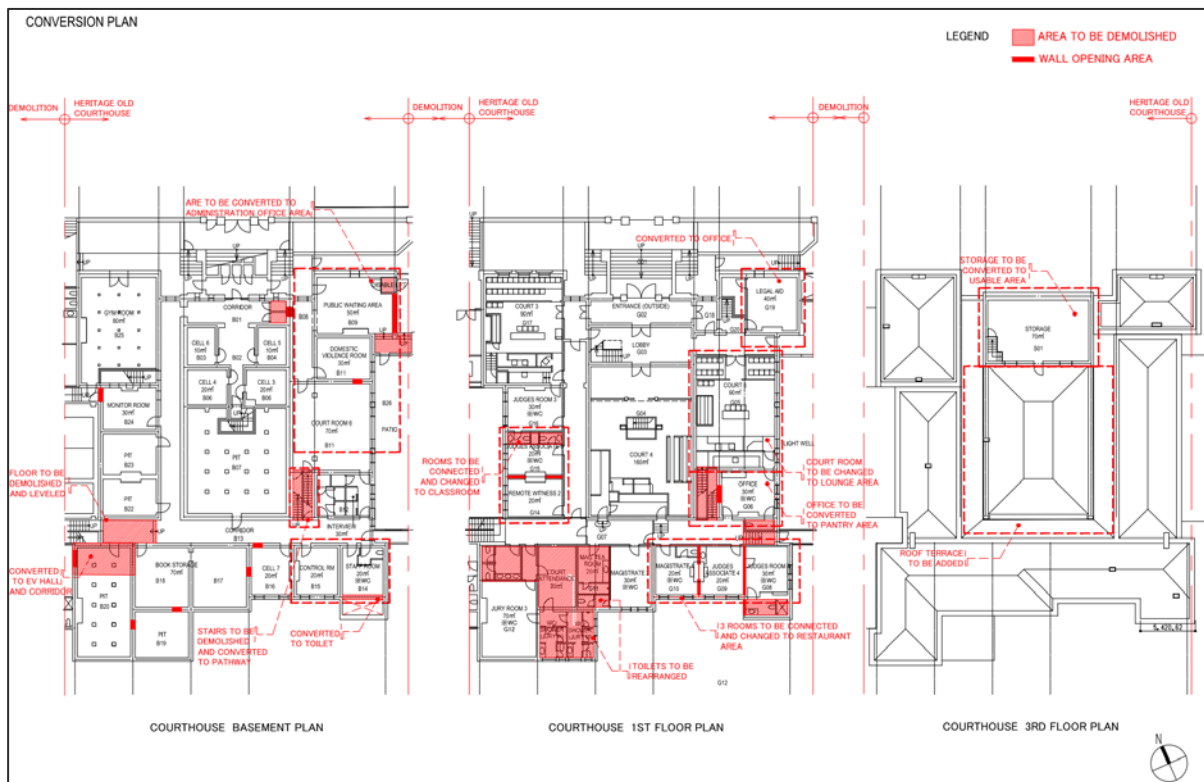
| Extent of internal works within the former Courthouse Building (Source: EIS)
